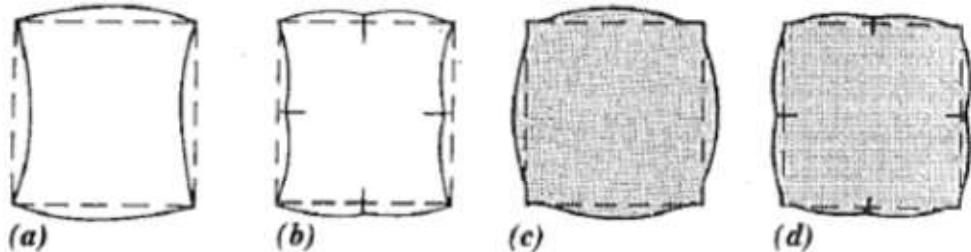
Failure modes of test specimens: (a) Steel column; (b) Stiffened steel column; (c) CFST column; (d) CFST columns with internal stiffener [32]
